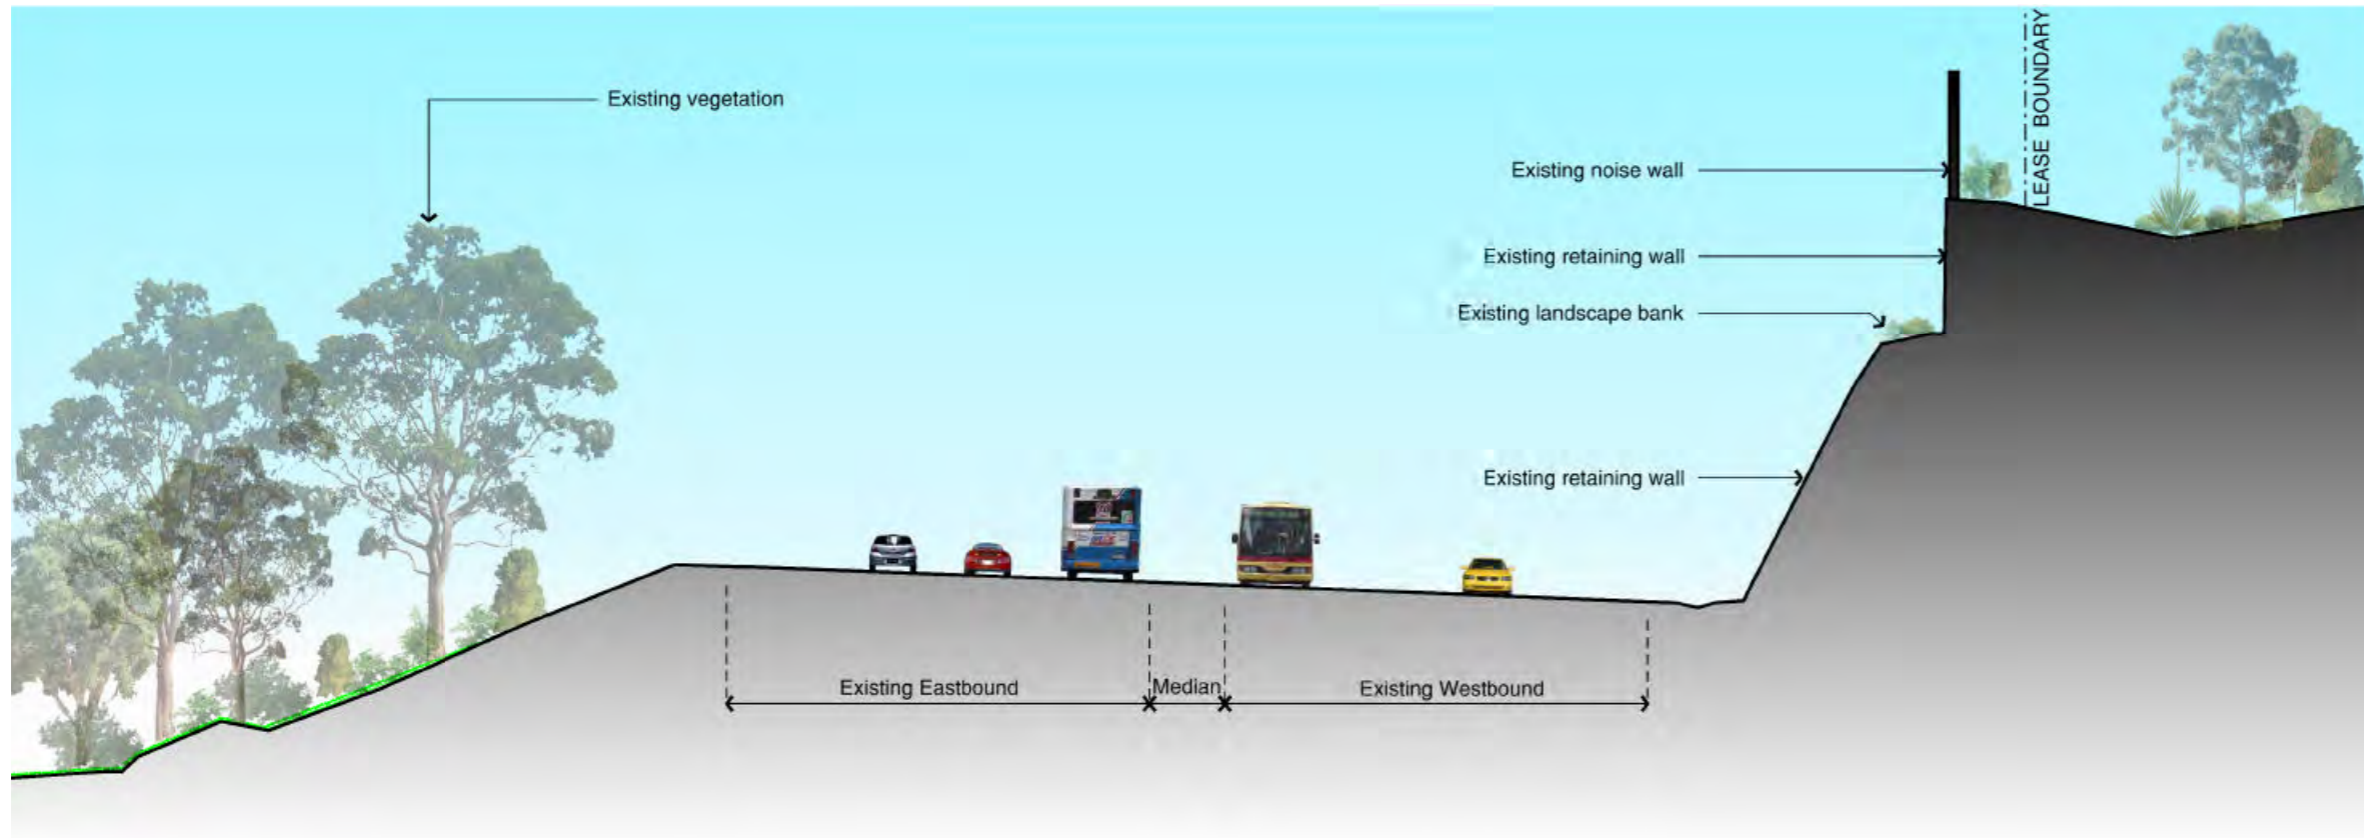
Stn 10350 Large cut with shotcrete - Existing
